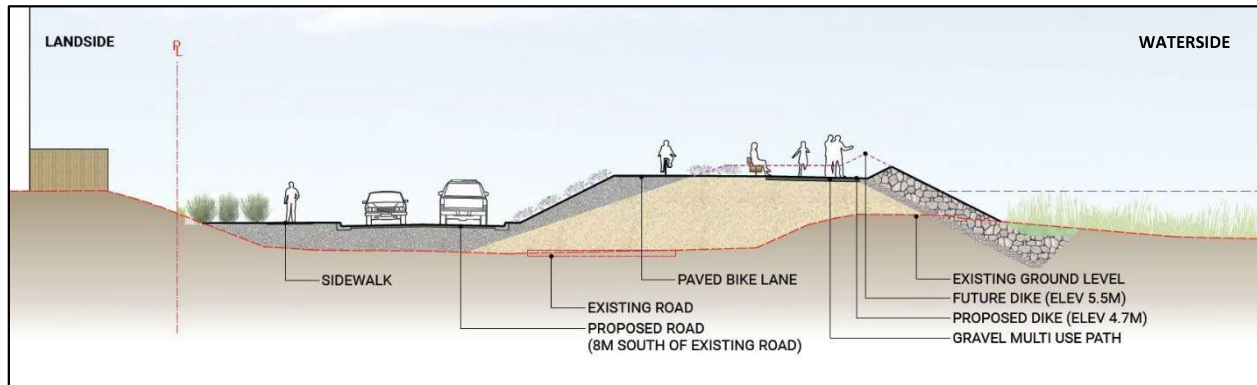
Alternative 1 Concept – Reduced Raising of Road
